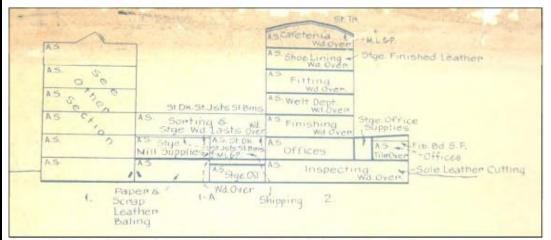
Section through building looking south showing cafeteria/recreation hall on 6th floor (1953).
